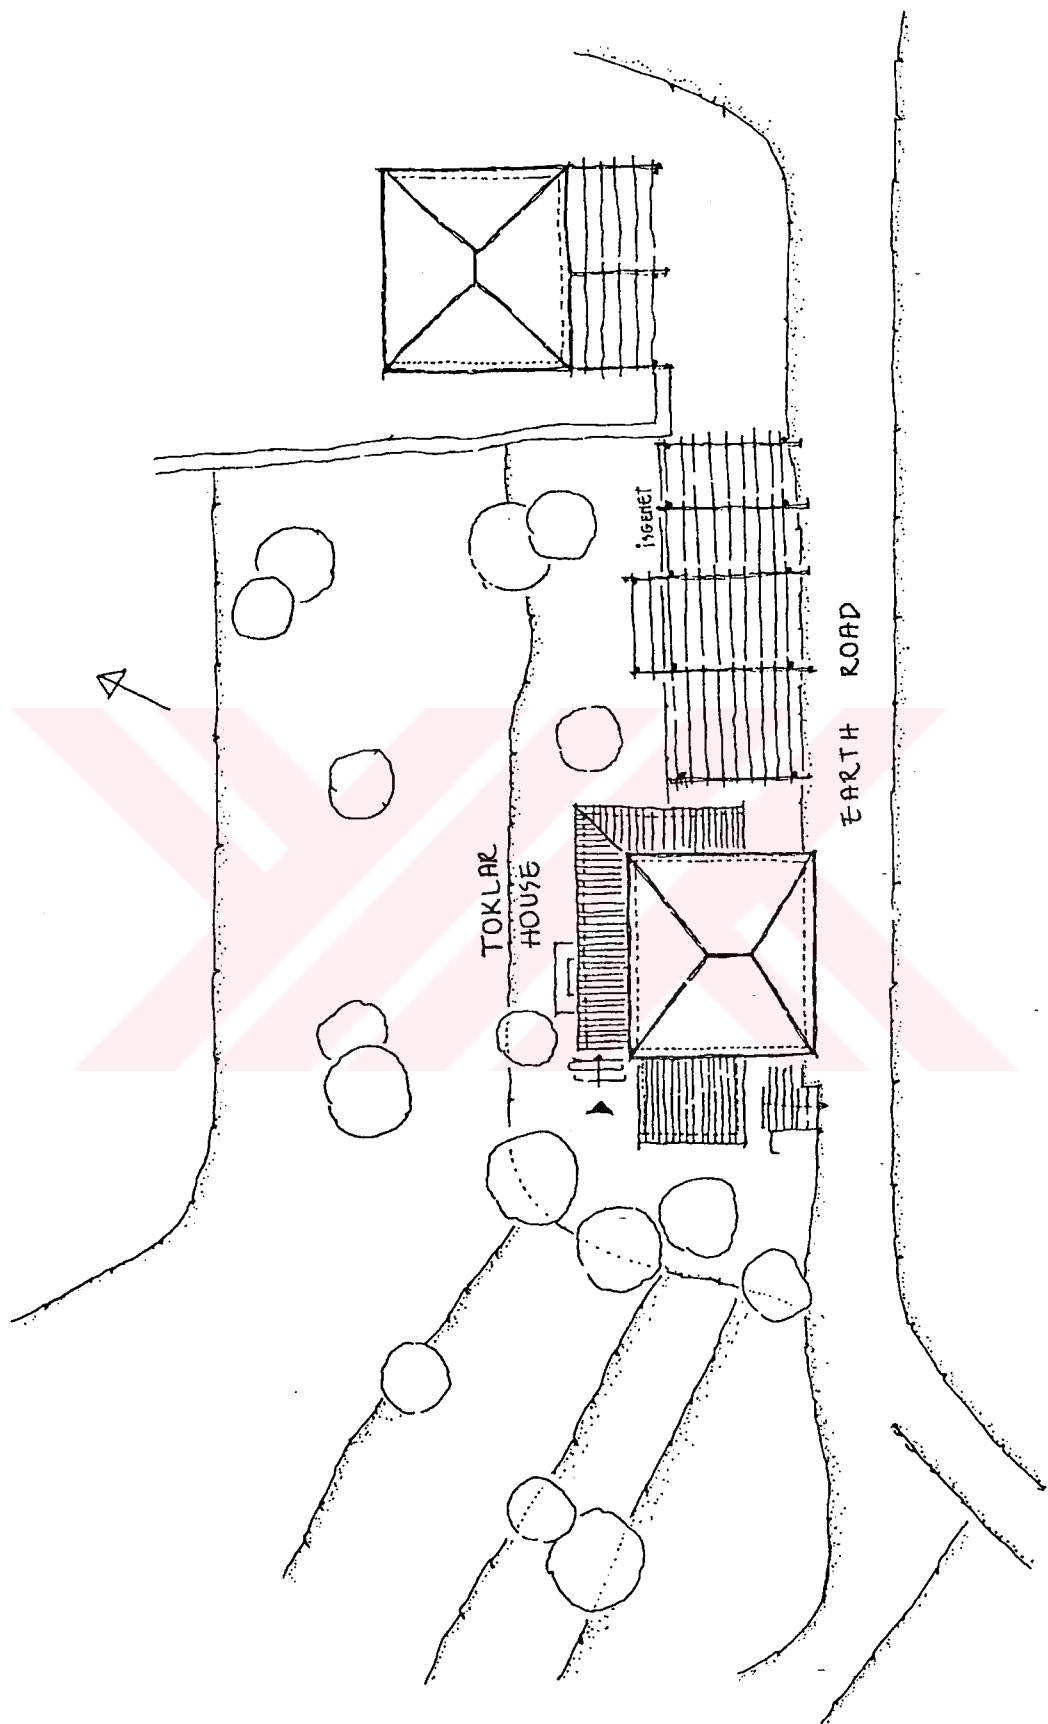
Schematic site plan of Toklar House - not to scale.
